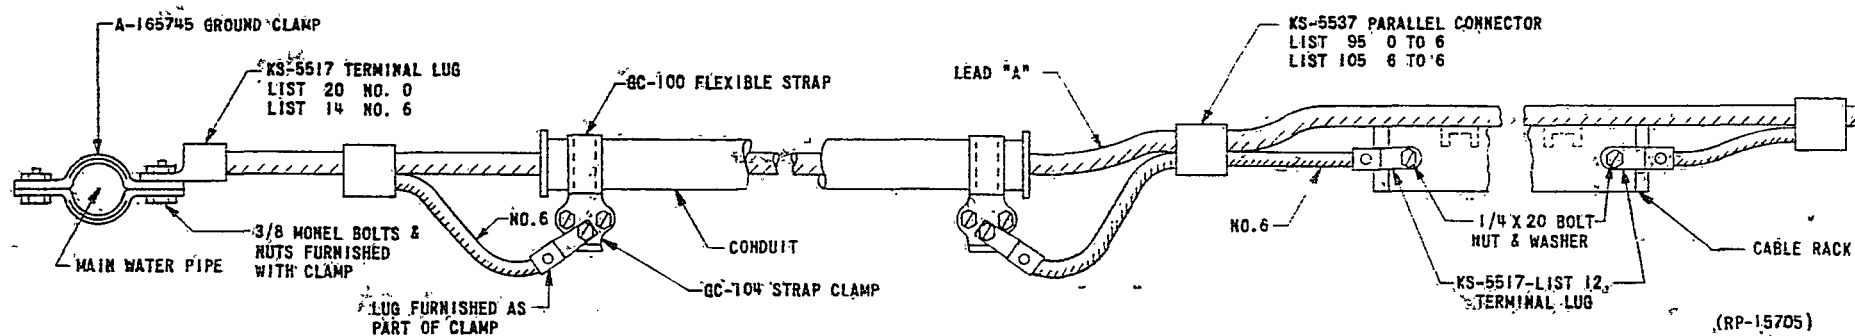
TYPICAL ARRANGEMENT OF GROUND LEADS TO WATER PIPE (SEE ADDITIONAL FIGURES)
